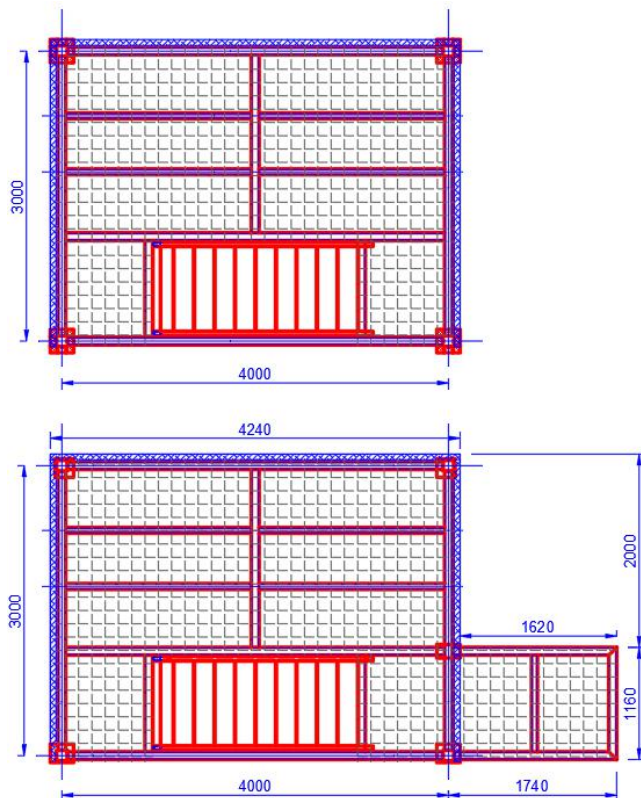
Plan views of the current platform (upper view) and of the top platform (lower view)
